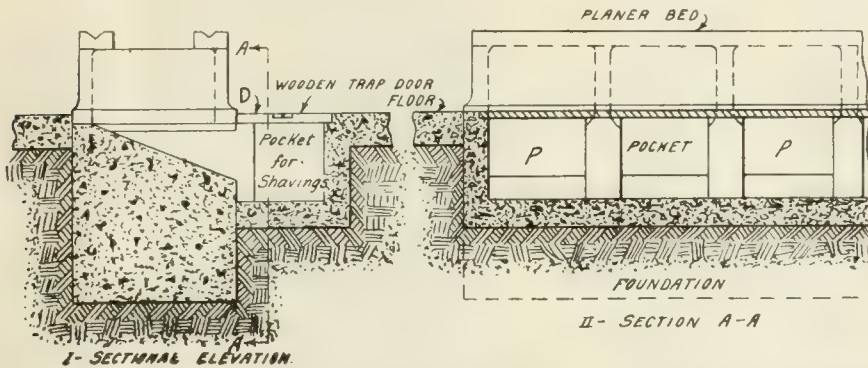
SHOWING DETAILS OF A PLANER FOUNDATION WITH POCKETS FOR SHAVINGS.
